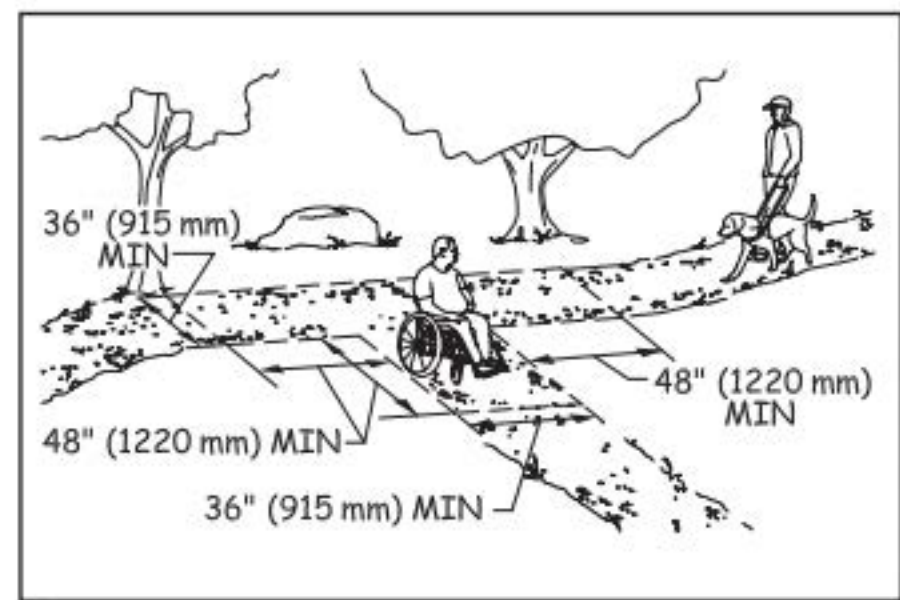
A T-intersection may be used as a passing space on an outdoor recreation access route or a beach access route if it has dimensions as shown, or larger.
